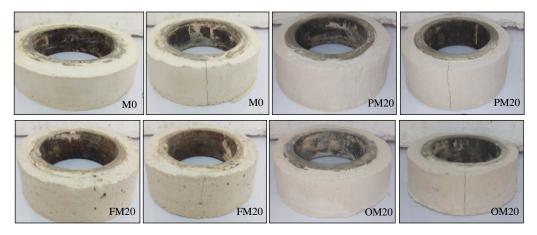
Samples subjected to shrinkage test before and after cracking
